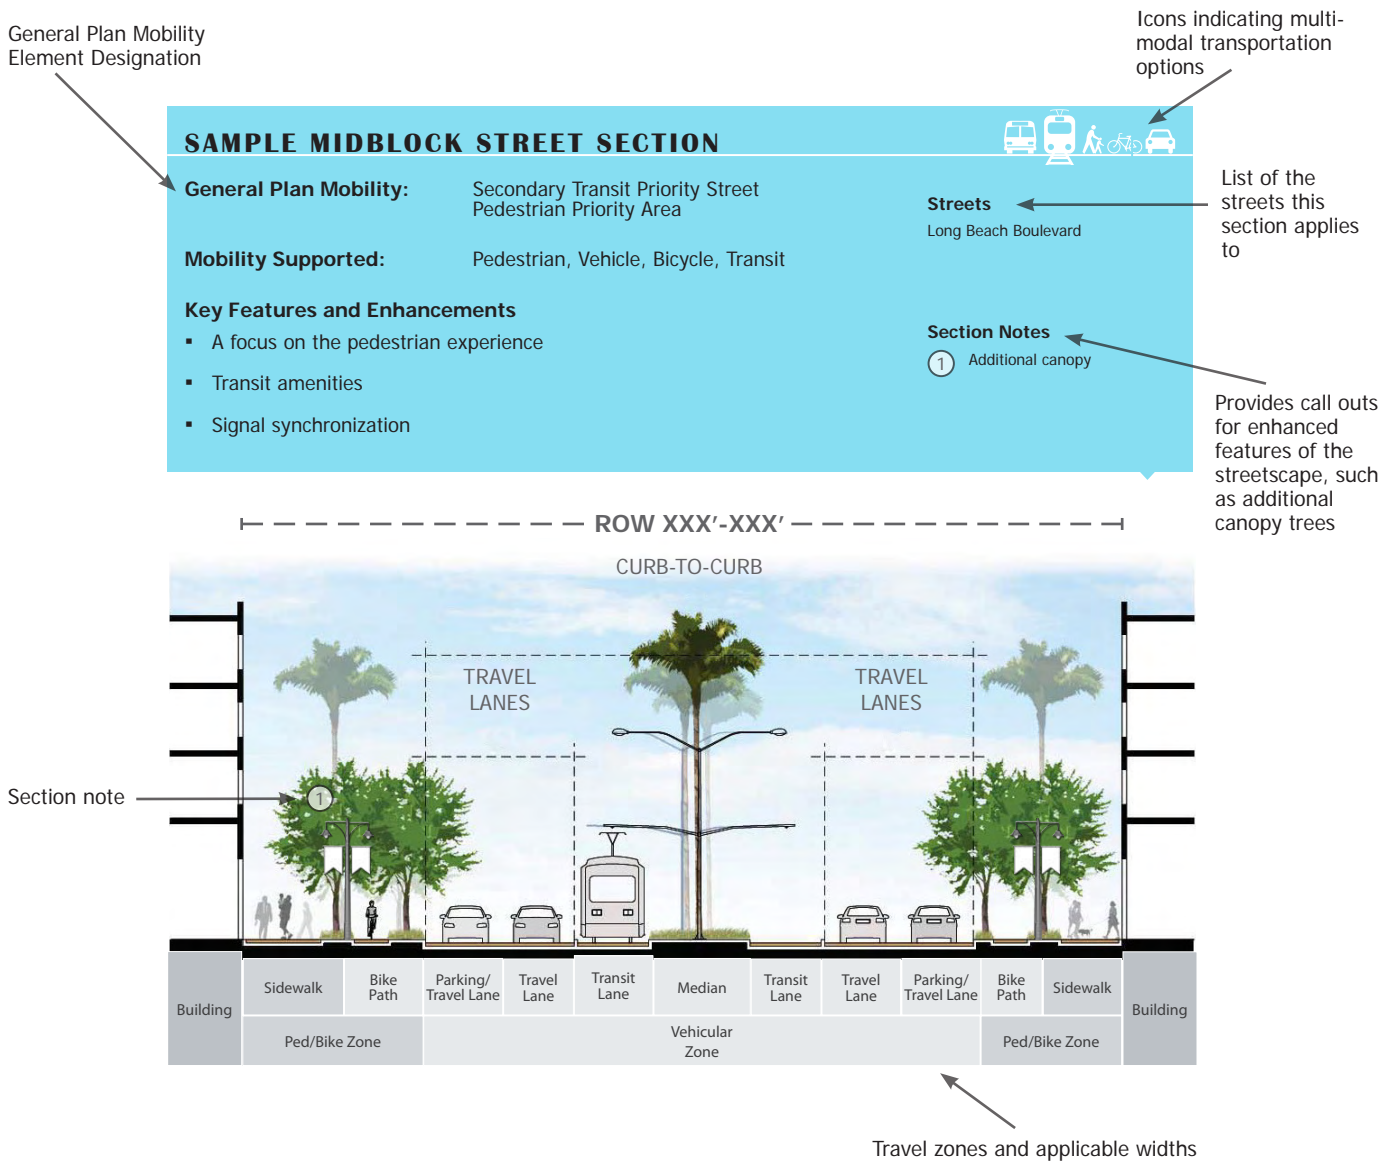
BOULEVARD (WITH SEPARATED BIKE PATHS)
